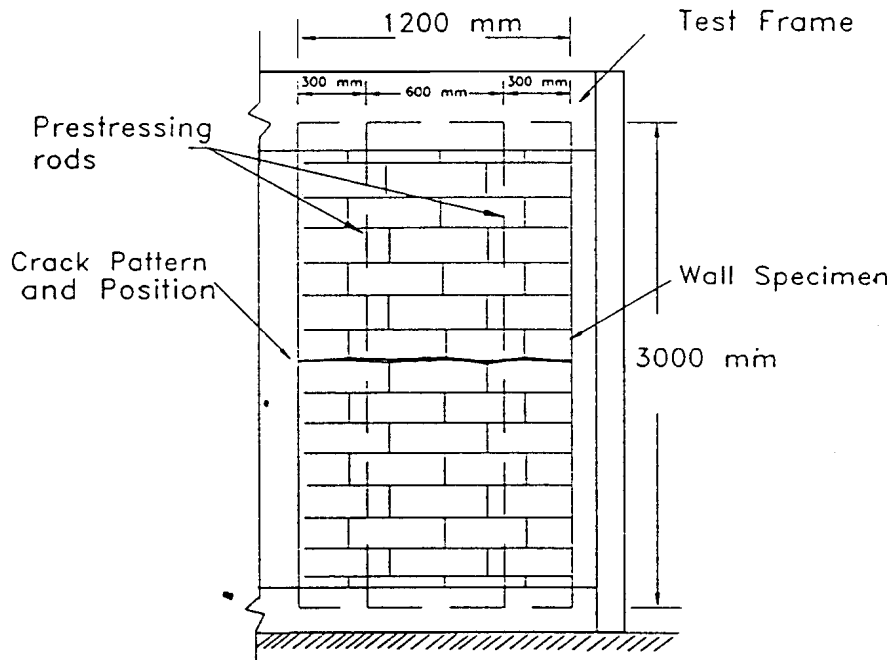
Typical Cracking Pattern for Top and Bottom Supported Prestressed Masonry Wall (Dawe and Aridru, 1993)
